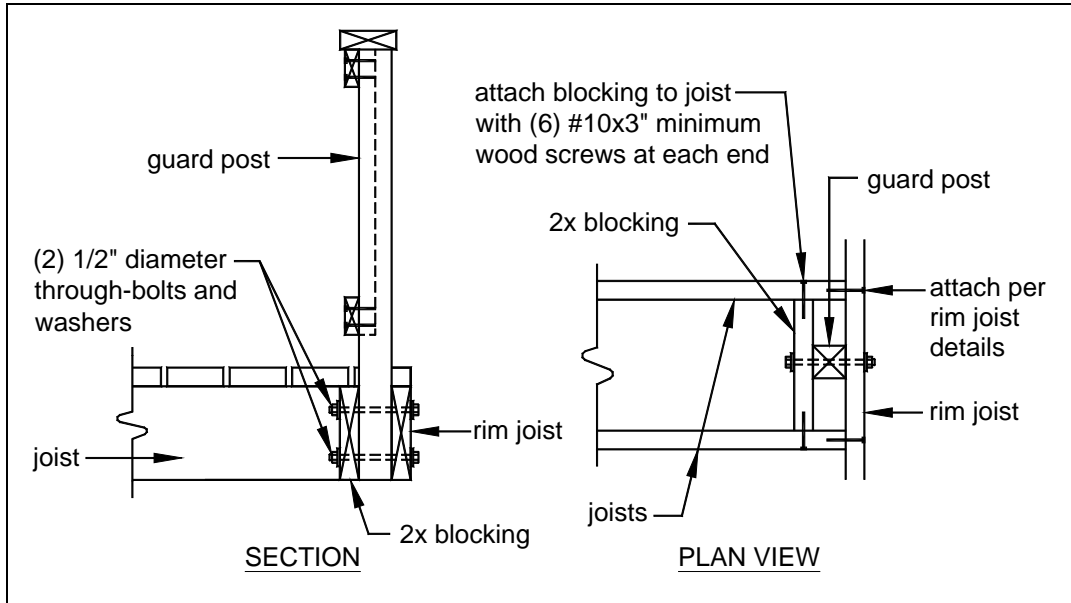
GUARD POST TO RIM JOIST DETAIL, OPTION 1
